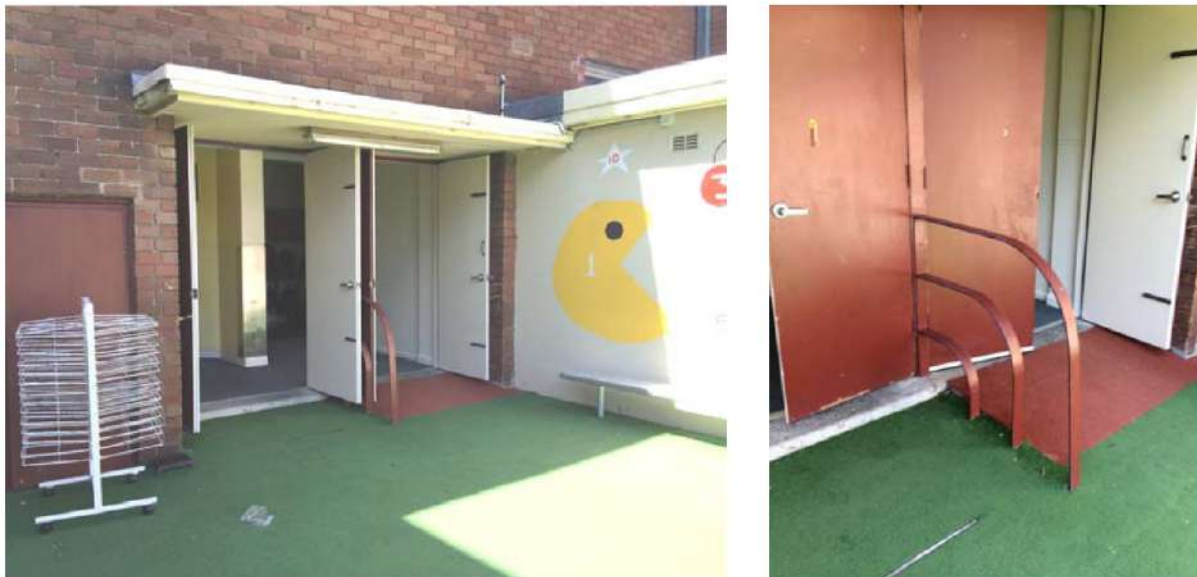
Doors and canopy associated with the secondary stair (left). This stylish streamlined railing provides some control to the movement of children through the door openings (right) (Source: TKD 2016: Fig 52)
